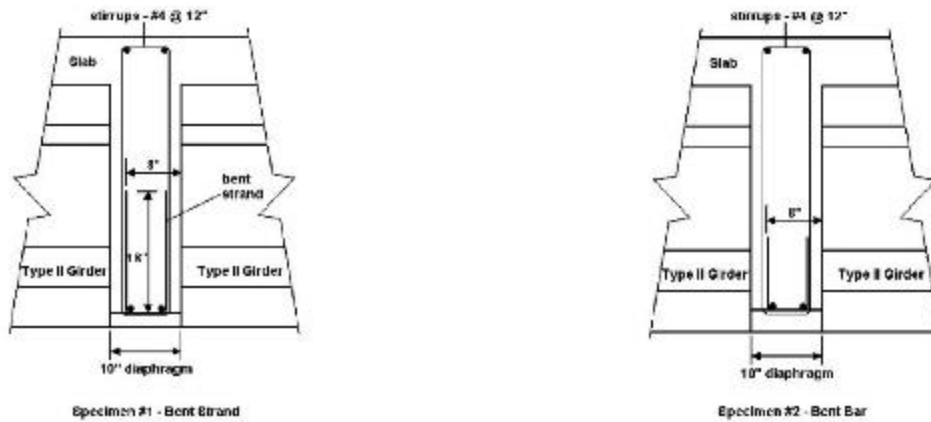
Details of the specimen #1 and # 2 connection (Miller 2004)
